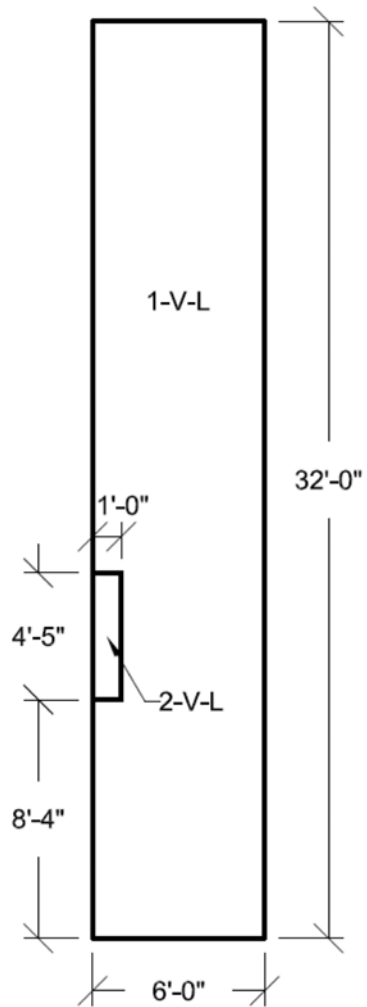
H.6-154A DGFOVS Slab 3 Looking Down
